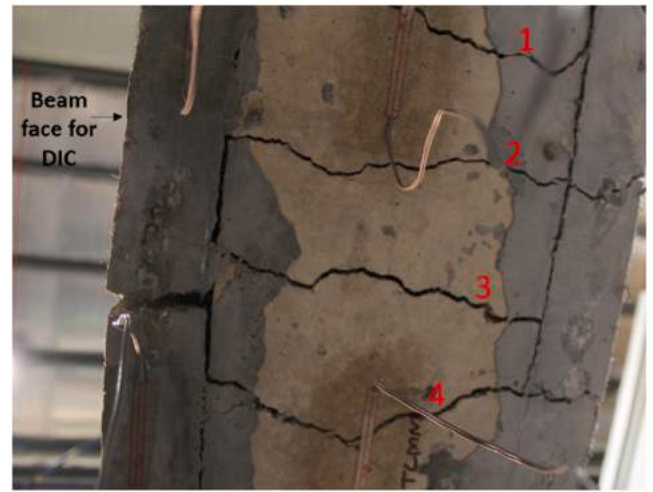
Cracking pattern at SB-2 beam soffit at end of test.
